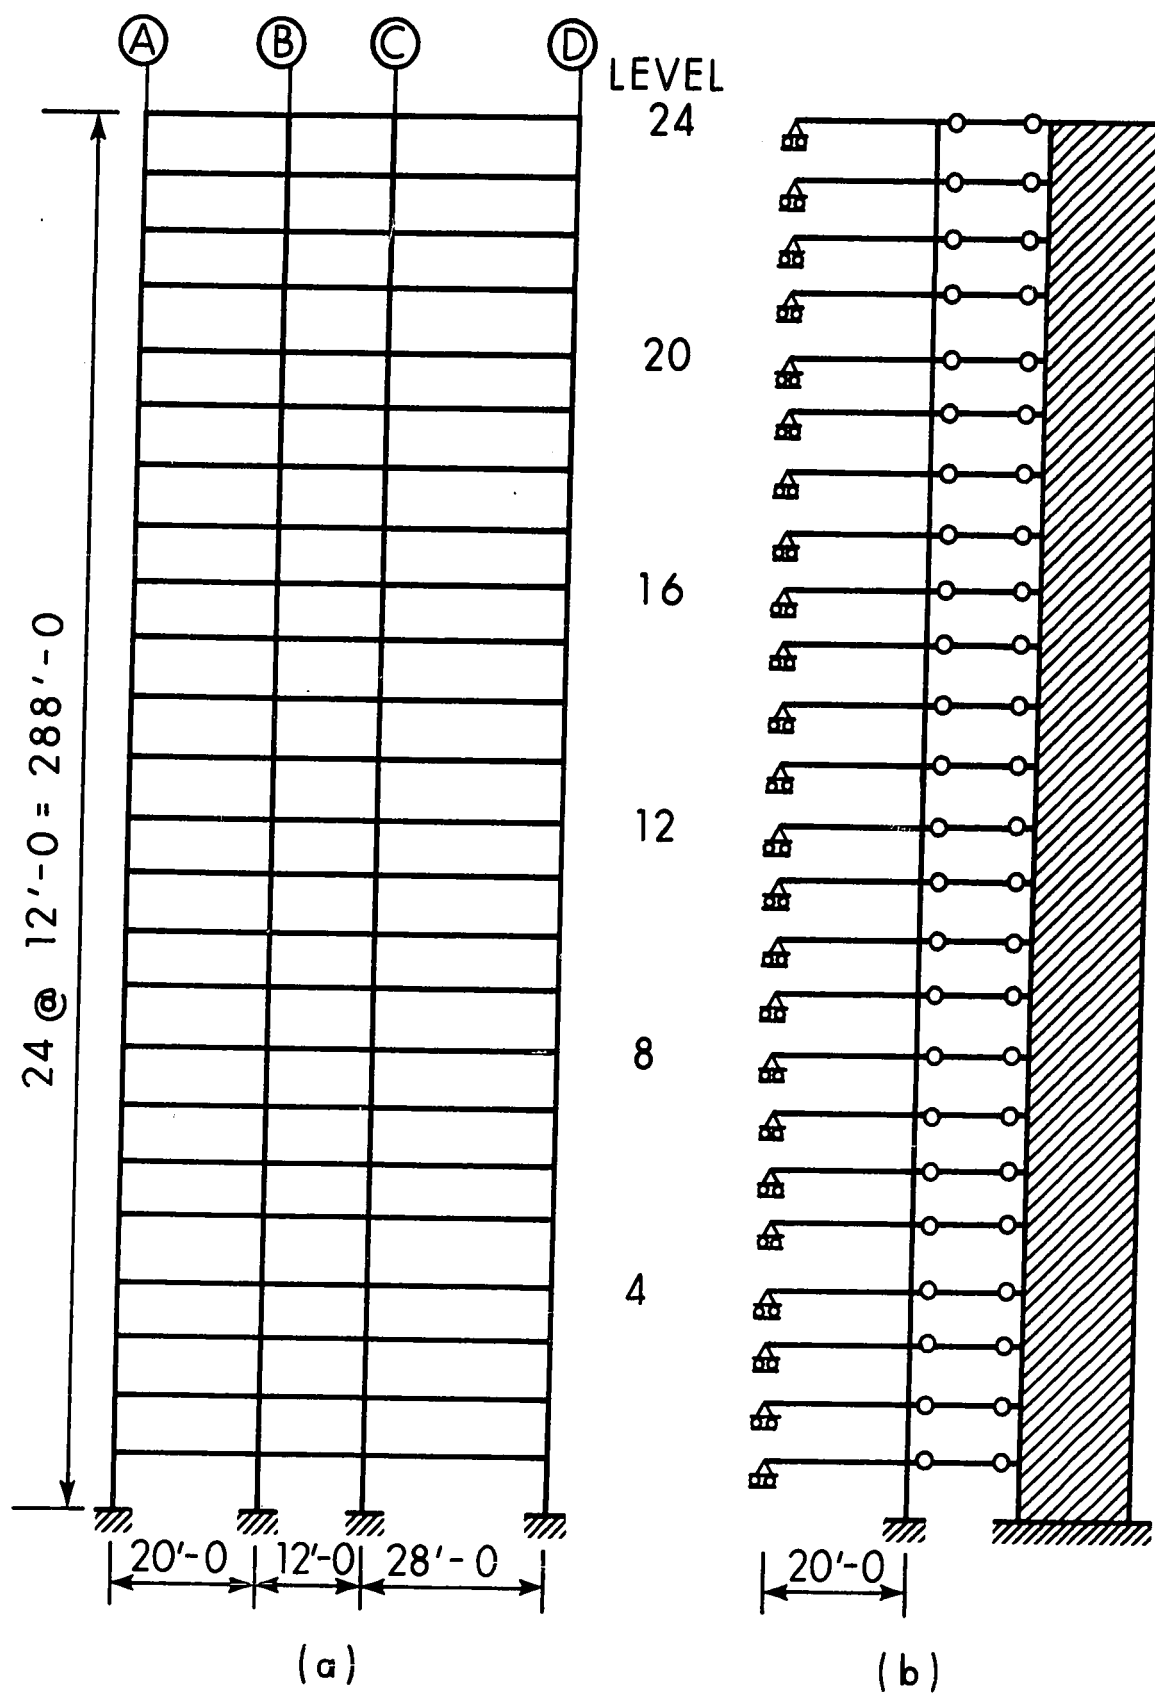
ELEVATION - 24 STORY BUILDING
